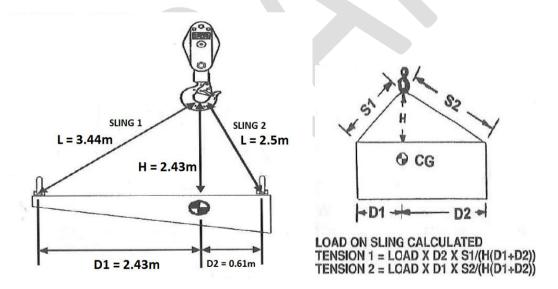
Example of a load with an off-set CG connected by two-legged slings joined to the hook
